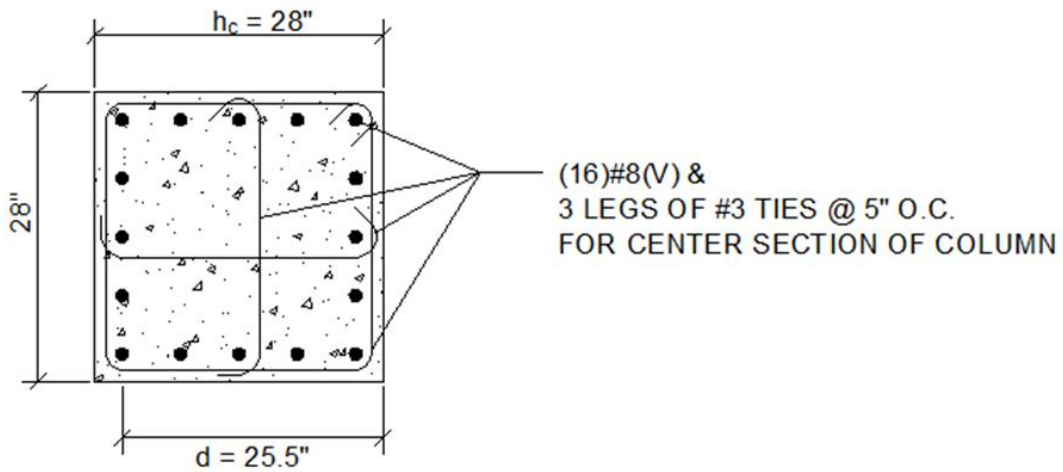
Exterior column, cross-section at center of column at the 2nd floor level based on tsunami design requirements.
